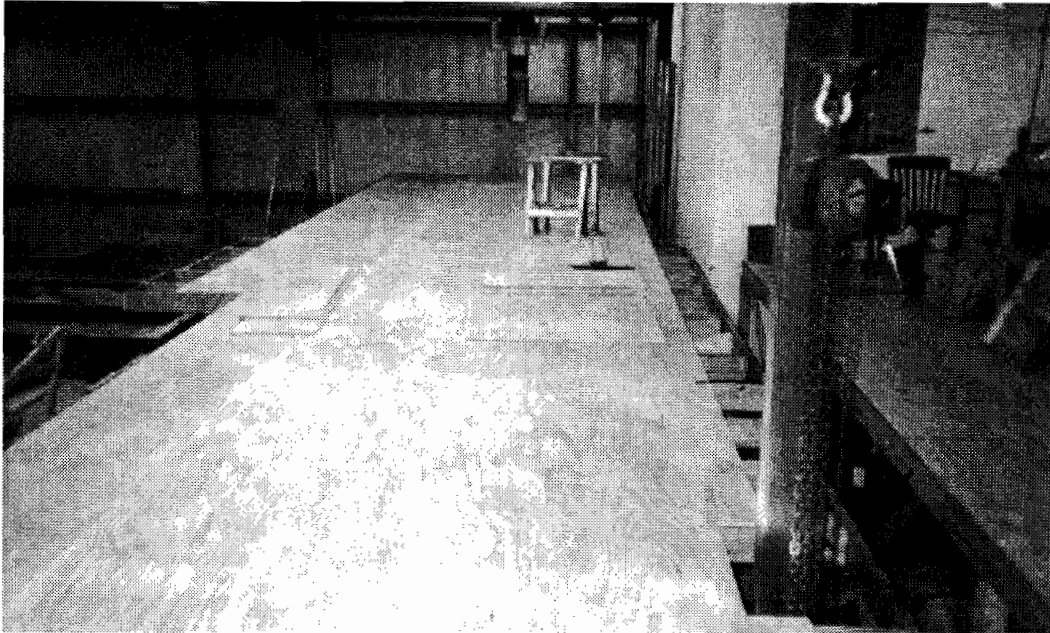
Plywood Deck Under Construction, Looking Upstream
